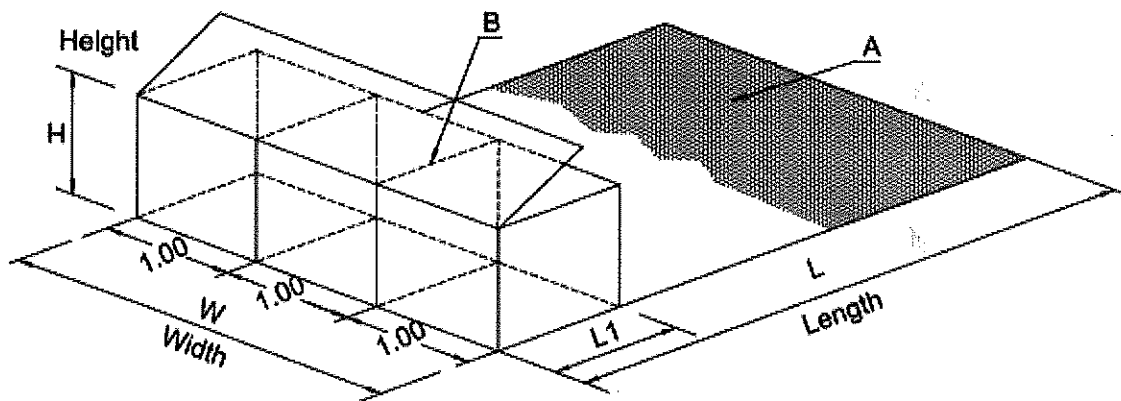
Gabion Facia units for facing of Reinforced Soil Structures
